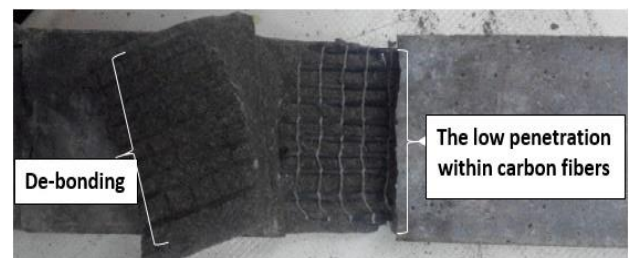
Debonding failure of concrete beam reinforced with one layers of textiles impregnated partially by epoxy
